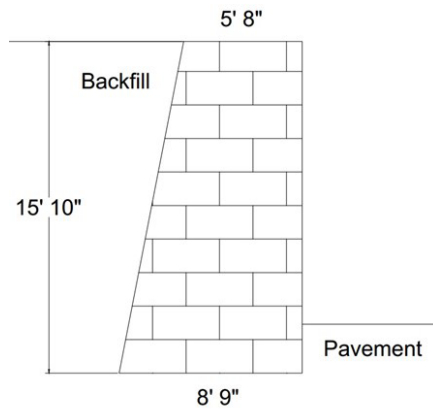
Diagram of masonry walls at Upland Avenue below the Upland (15 ft) instrumentation location (Diagram courtesy of Amtrak)
